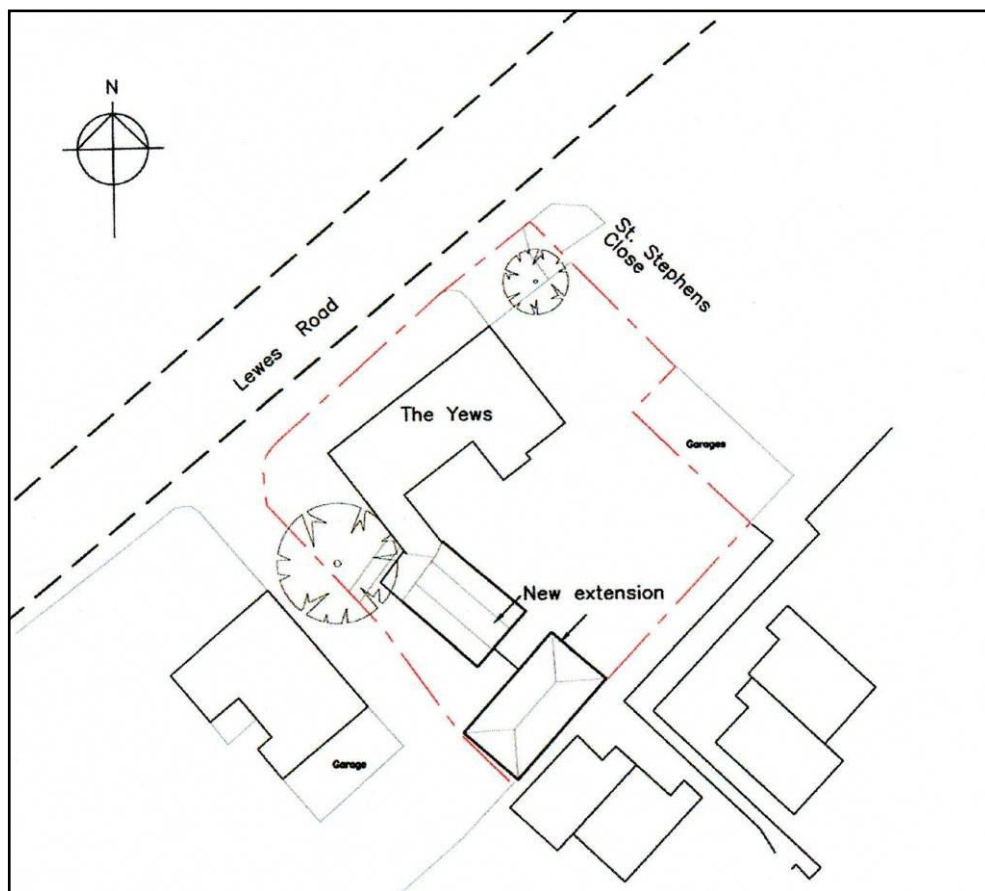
The Yews, Lewes Road, Ringmer: Site development Plan
